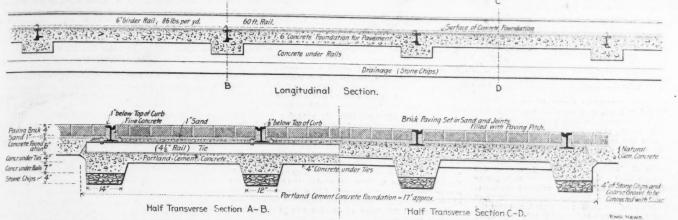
SECTION OF EAST MAIN ST., ROCHESTER, N. Y., SHOWING DETAILS OF STREET RAILWAY TRACK CONSTRUCTION.
